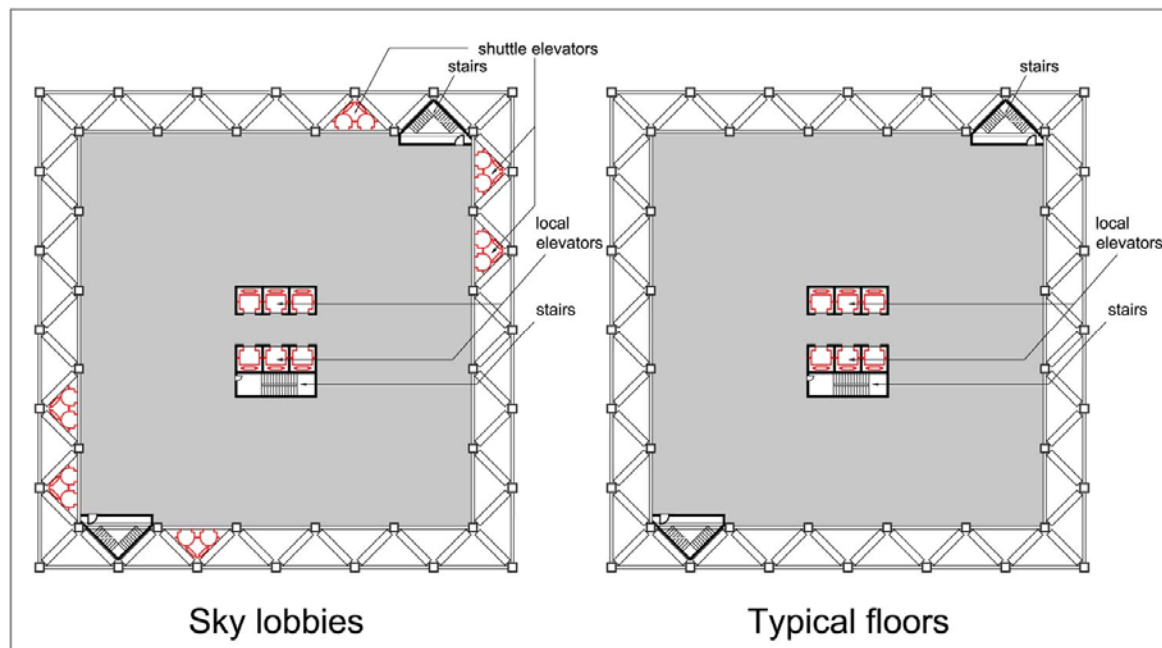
Elevators and stairwells at the sky lobbies and typical floors
